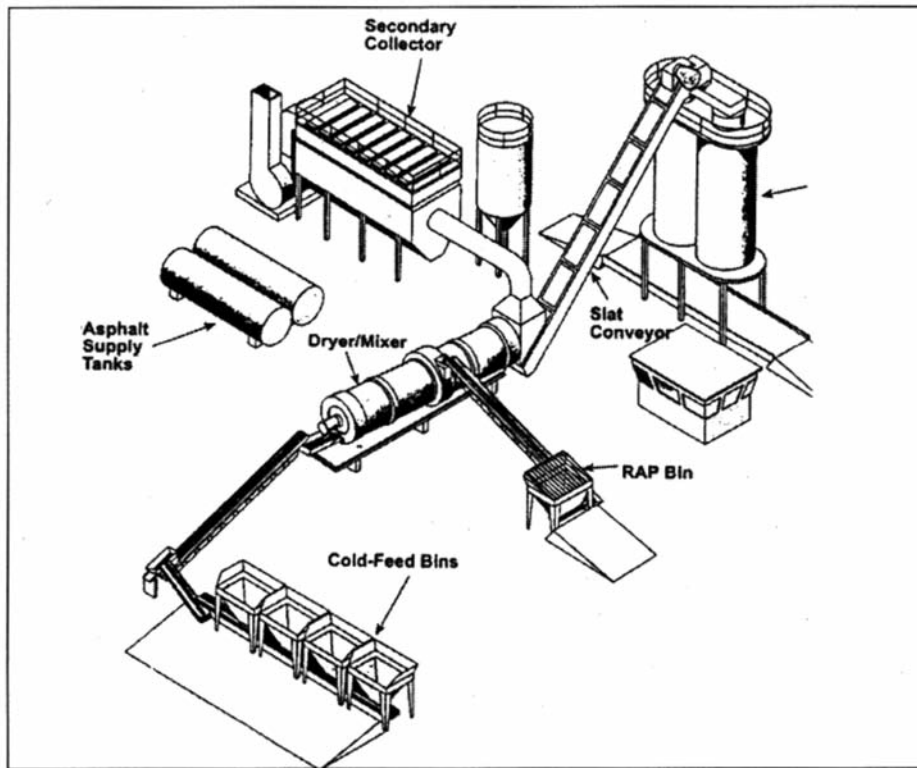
Typical components of a drum-type hot mix asphalt plant.
